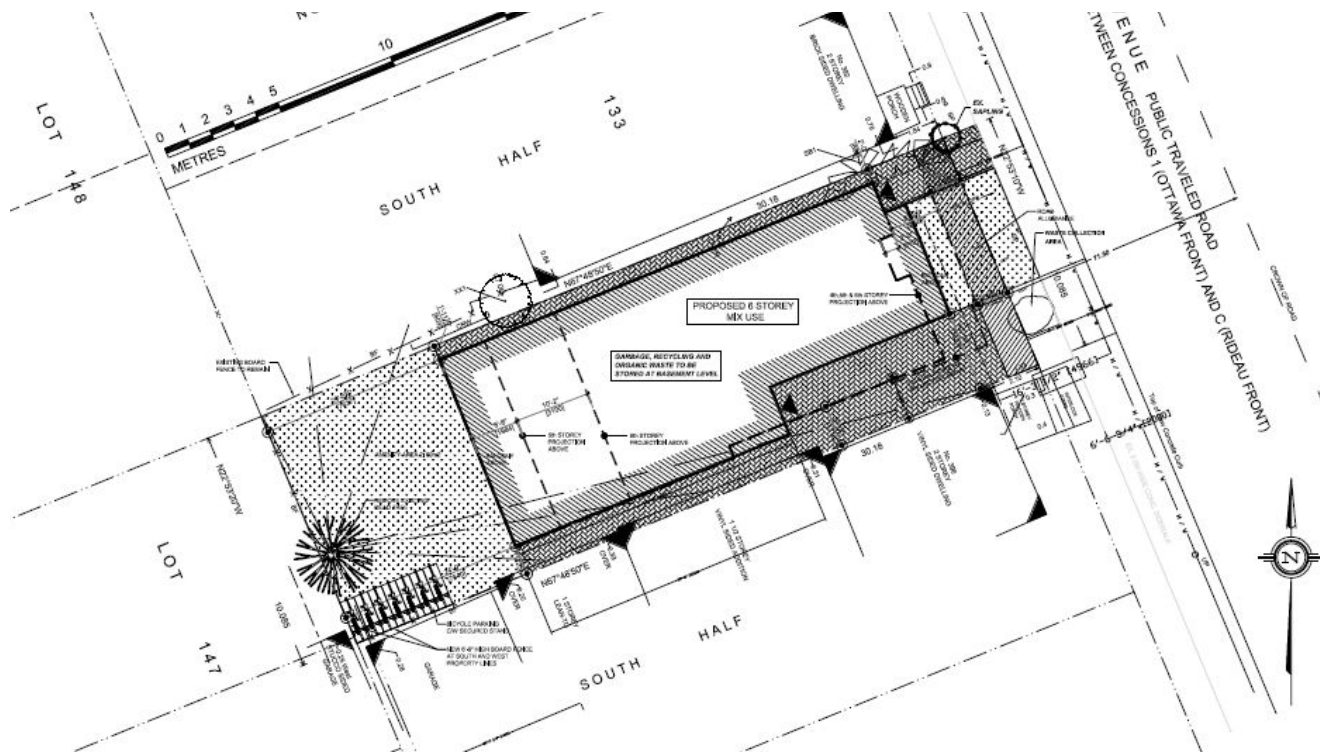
BRONSON AVENUE, PROPOSED SITE PLAN, SOMA STUDIOS 2016
